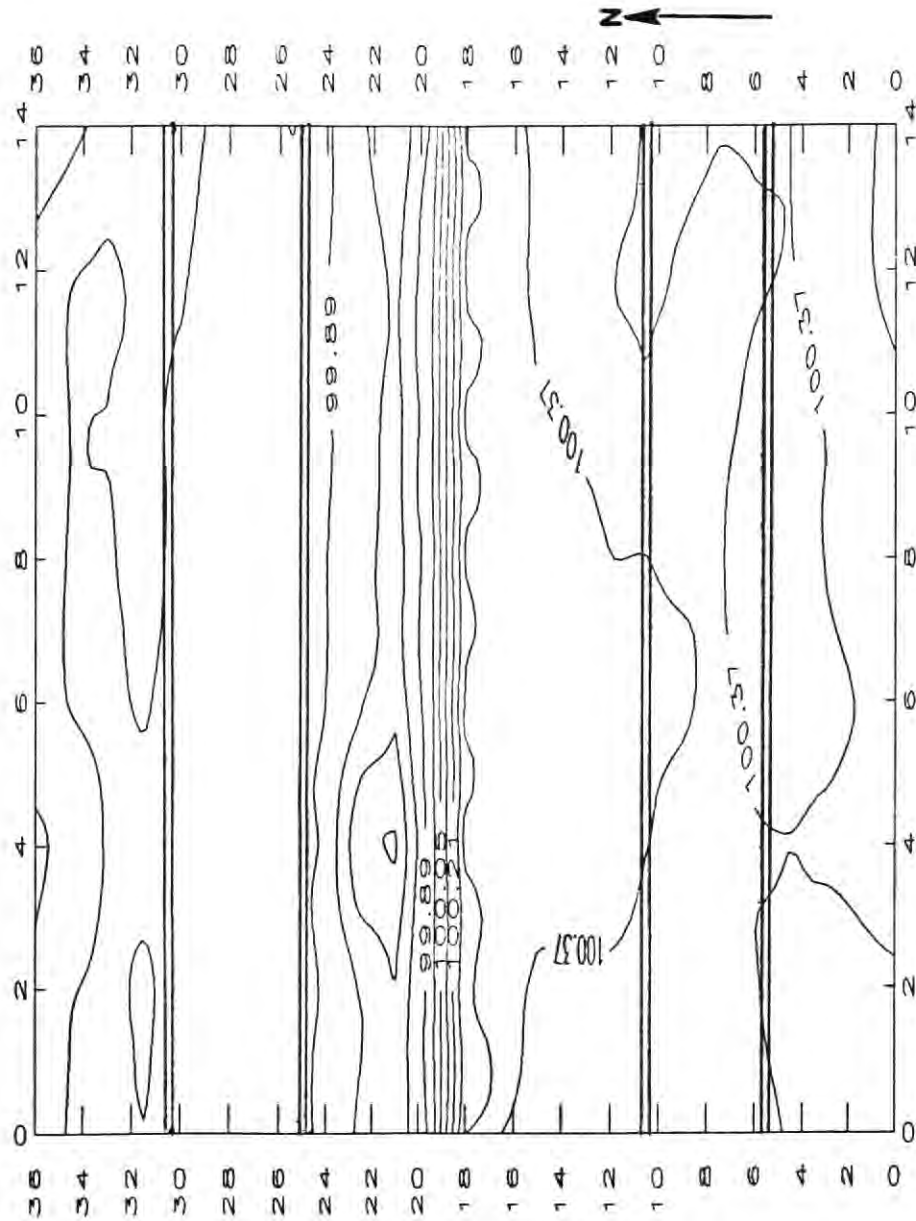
Sale Barn Road, at Ft. Pierre (Timber)
